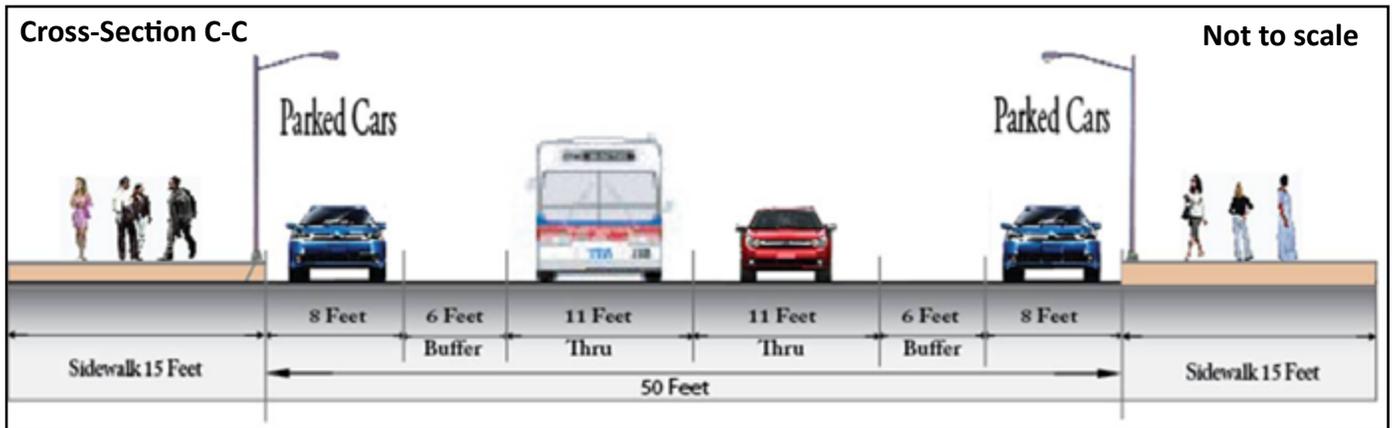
Proposed Configuration for West 66th Street west of Amsterdam Avenue
